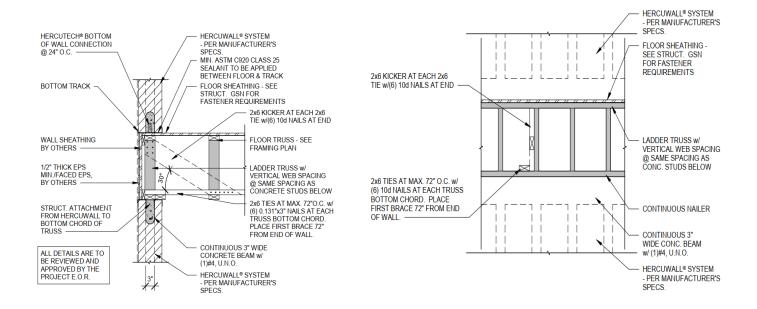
HercuWall® Truss Parallel to Wall (Section)
